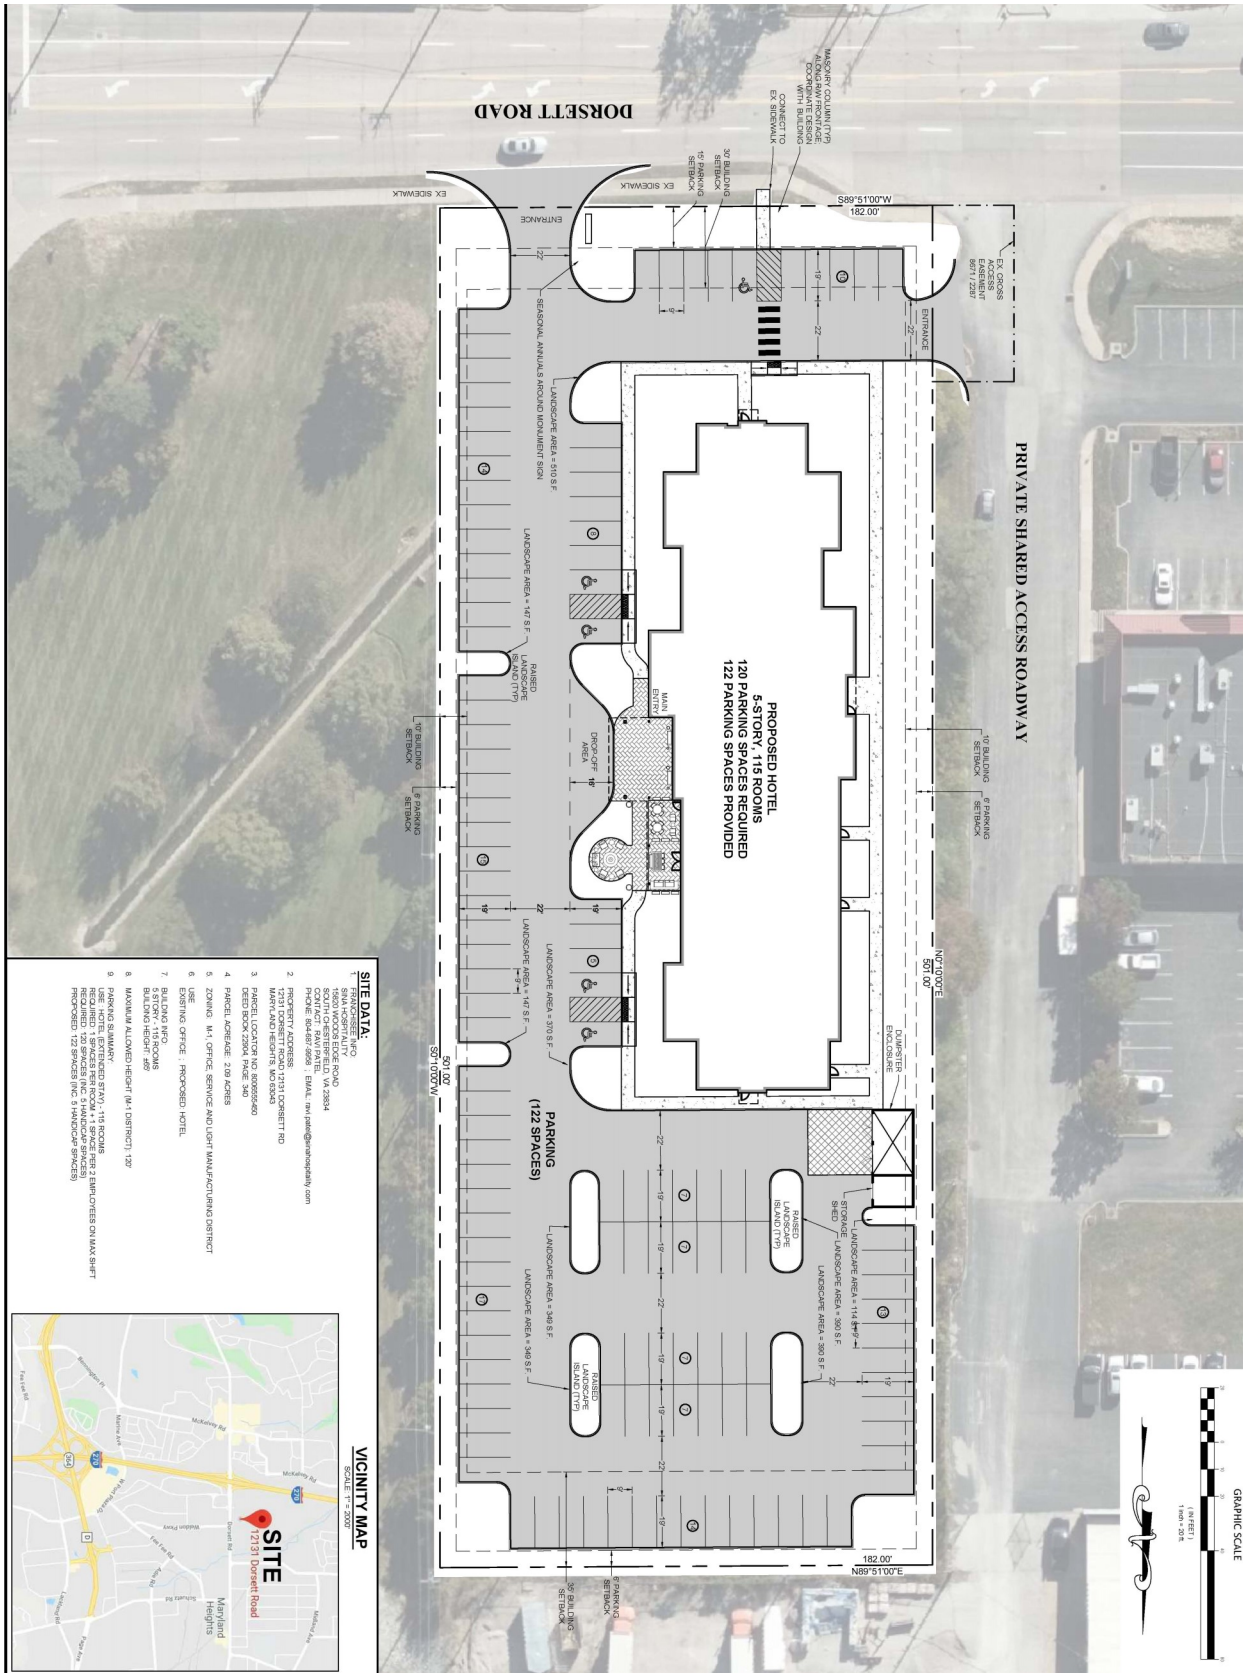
EXHIBIT F: SCHEMATIC LAYOUT (TOWNEPLACE SUITES)
